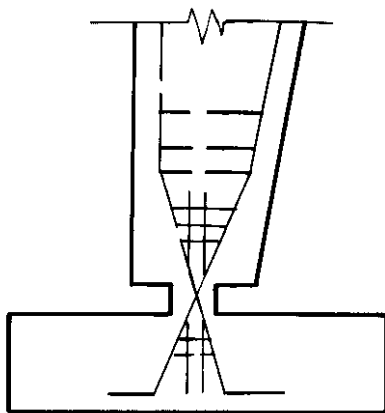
Hinge built with reinforcing bars at the top of a footing.
